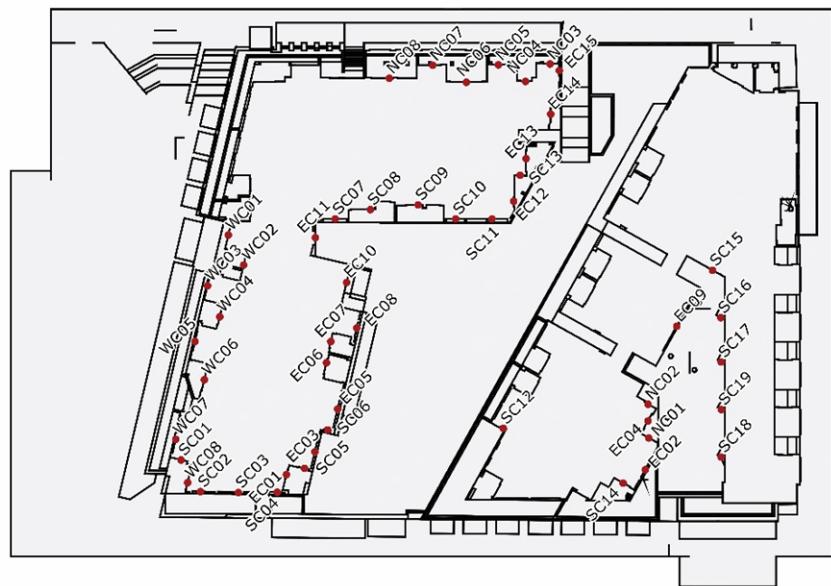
Layout of Pressure Sensors – Level 2 Plan
